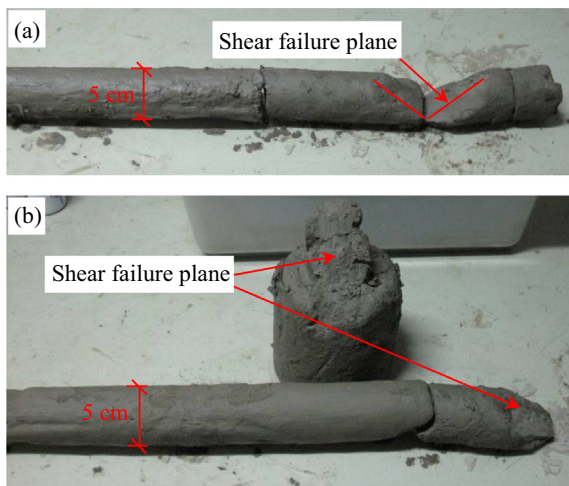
Photos of excavated columns: (a) failed conventional column (after Ni et al. (2019b)), and (b) failed T-shaped column.
